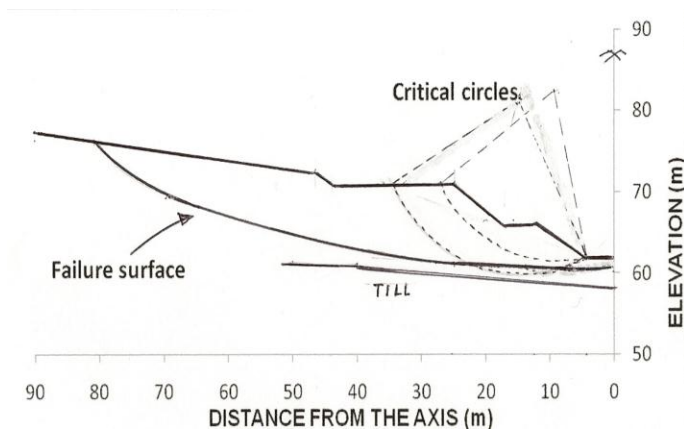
Cross-section of the failed slope (Sketch from a figure after Kankare, 1969).
